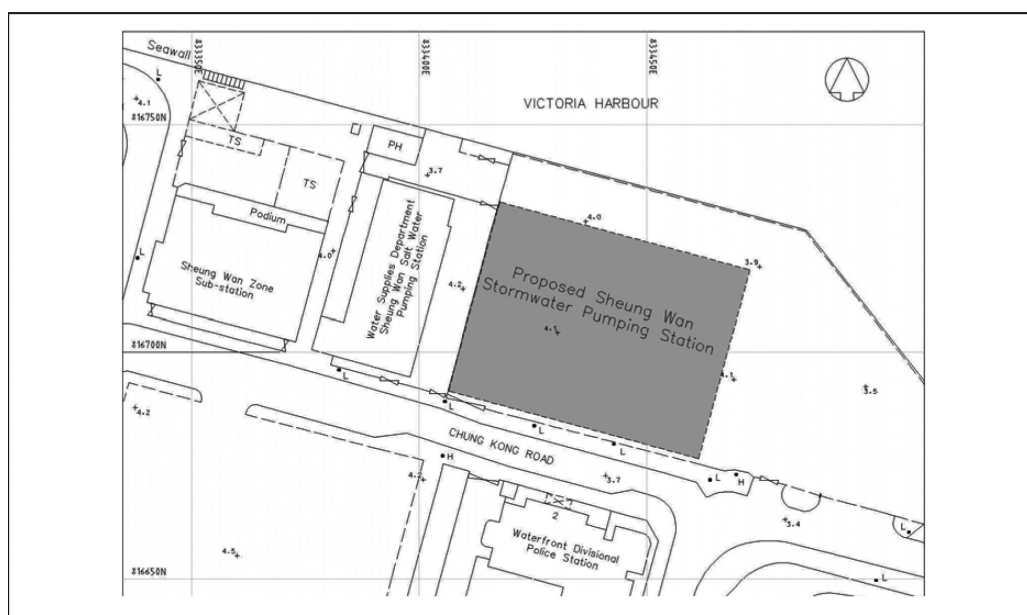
Location Plan of Sheung Wan Stormwater Pumping Station
